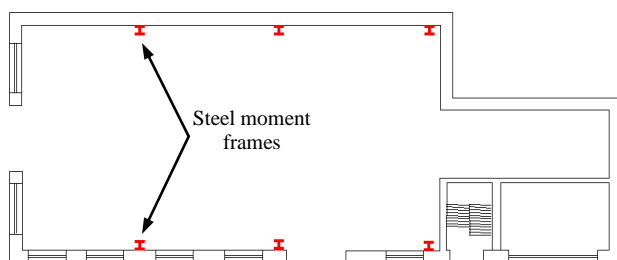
Floor plan of Joe's Garage Cafe, showing retrofit.
